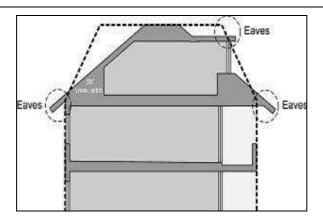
Pitched roof attic: Eaves may project beyond the building envelope by up to 1m.
